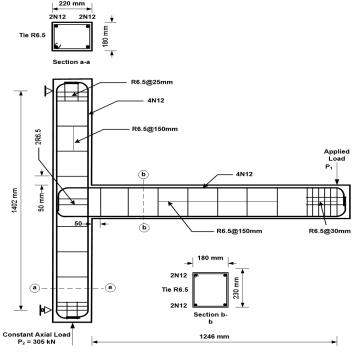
Specimen's details (Mahini & Ronagh, 2011)
